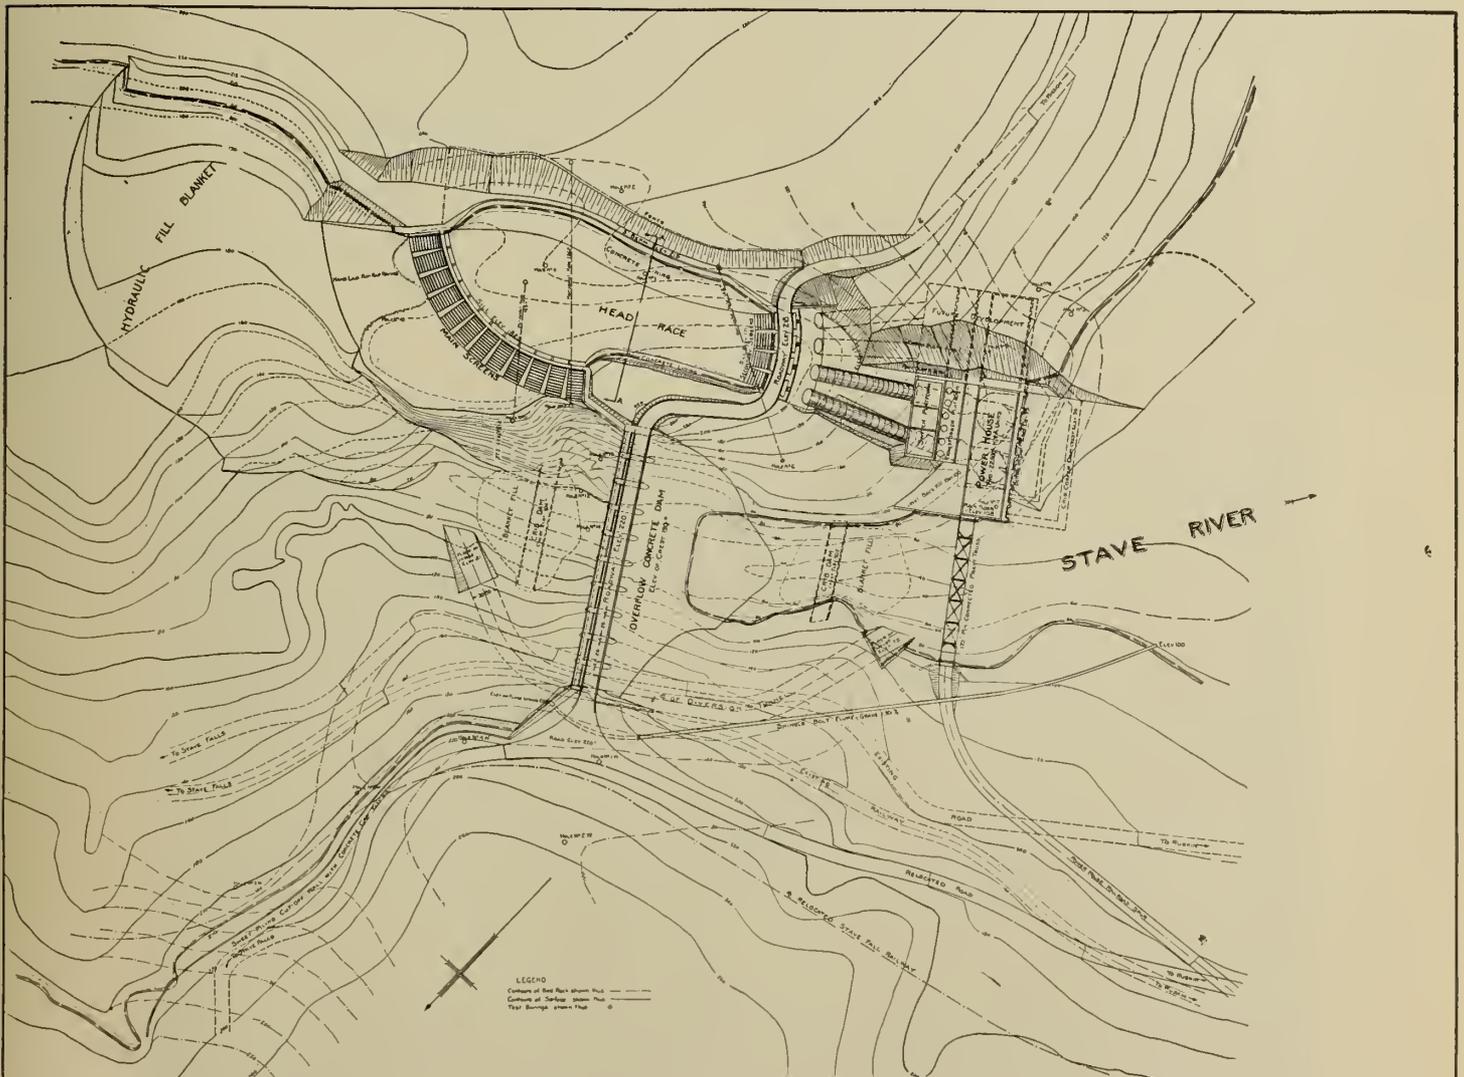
Ruskin Power Development—General Plan of Proposed Plant.
